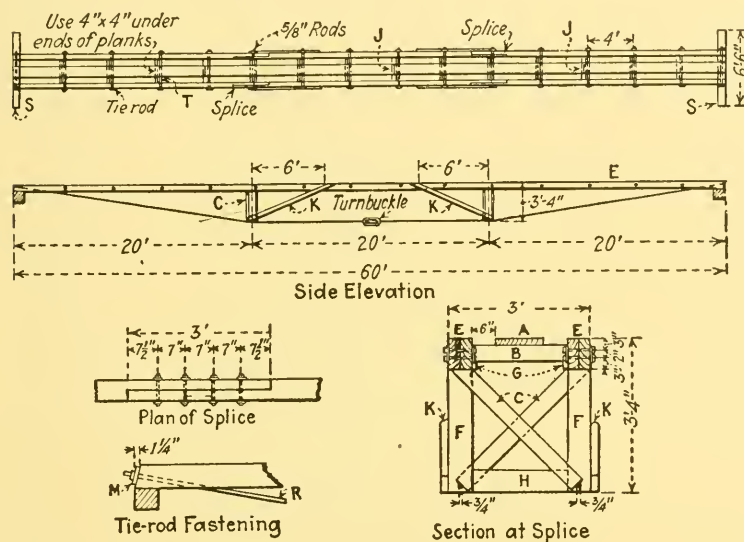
Plans for standard footbridge. (Reproduced from Plate XXXIII, U. S. Water Supply Paper 371.)
